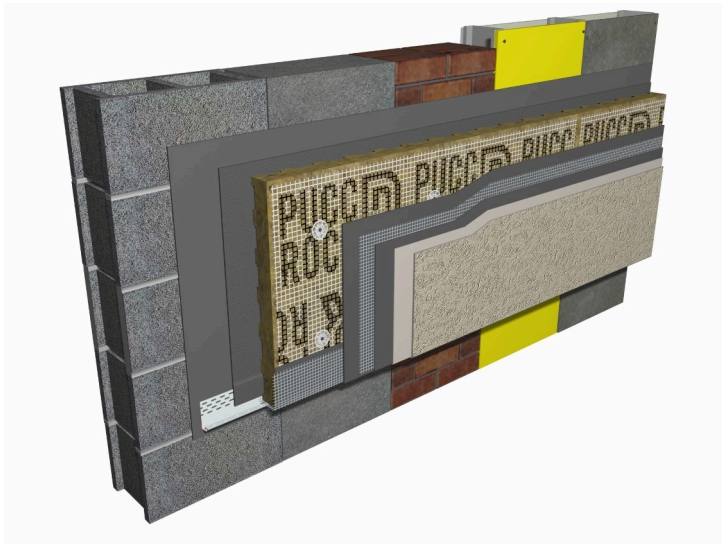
Puccs NC EIFS with Cement Bear and Prep Coat (or Prep Coat D) over masonry, concrete, brick, glass-fibre faced-gypsum board and cement board.
